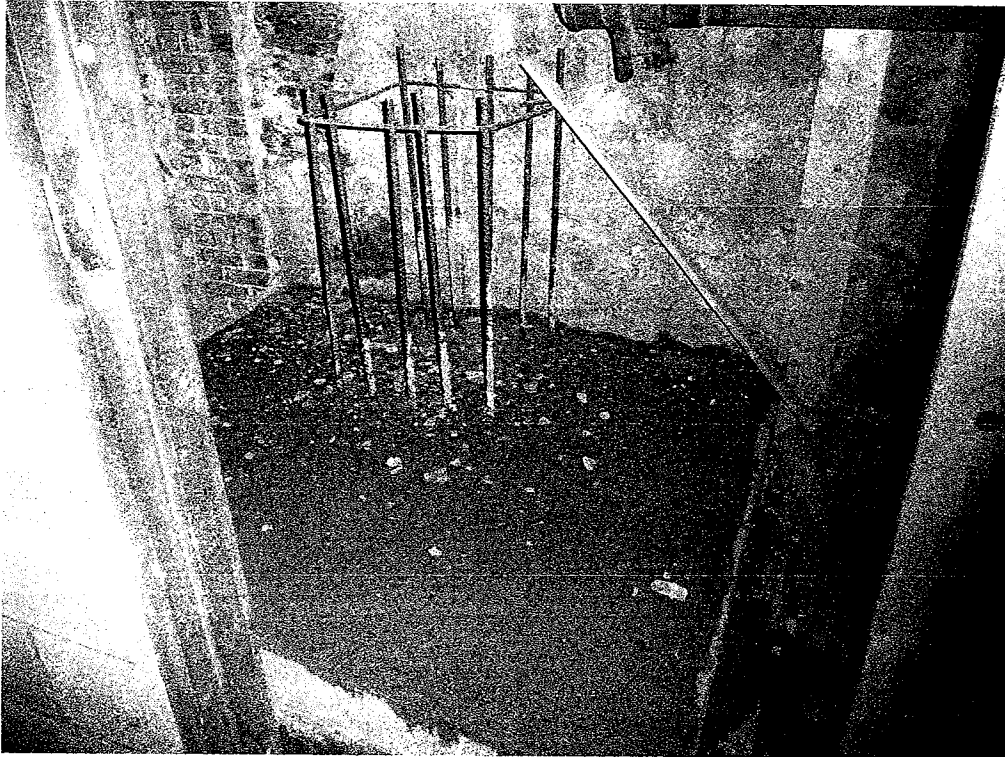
New Concrete footing adjacent to A/4.2 foundation
